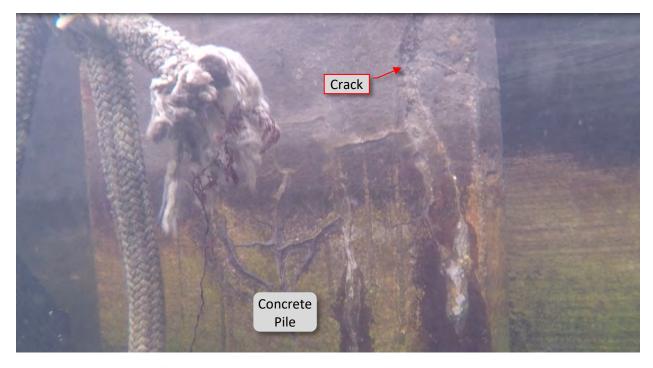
P1. STA 1+23. Crack/spall on pile. Underwater view.
